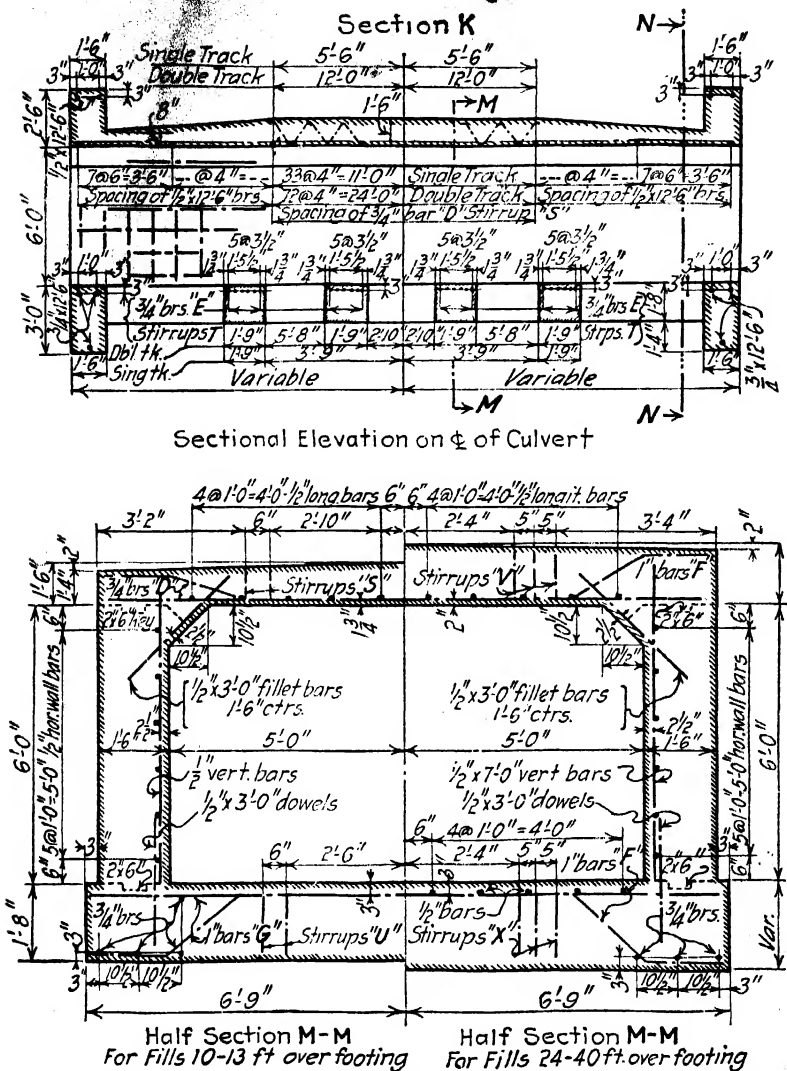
Details of a standard rectangular culvert of C. M. & St. P. Ry.
